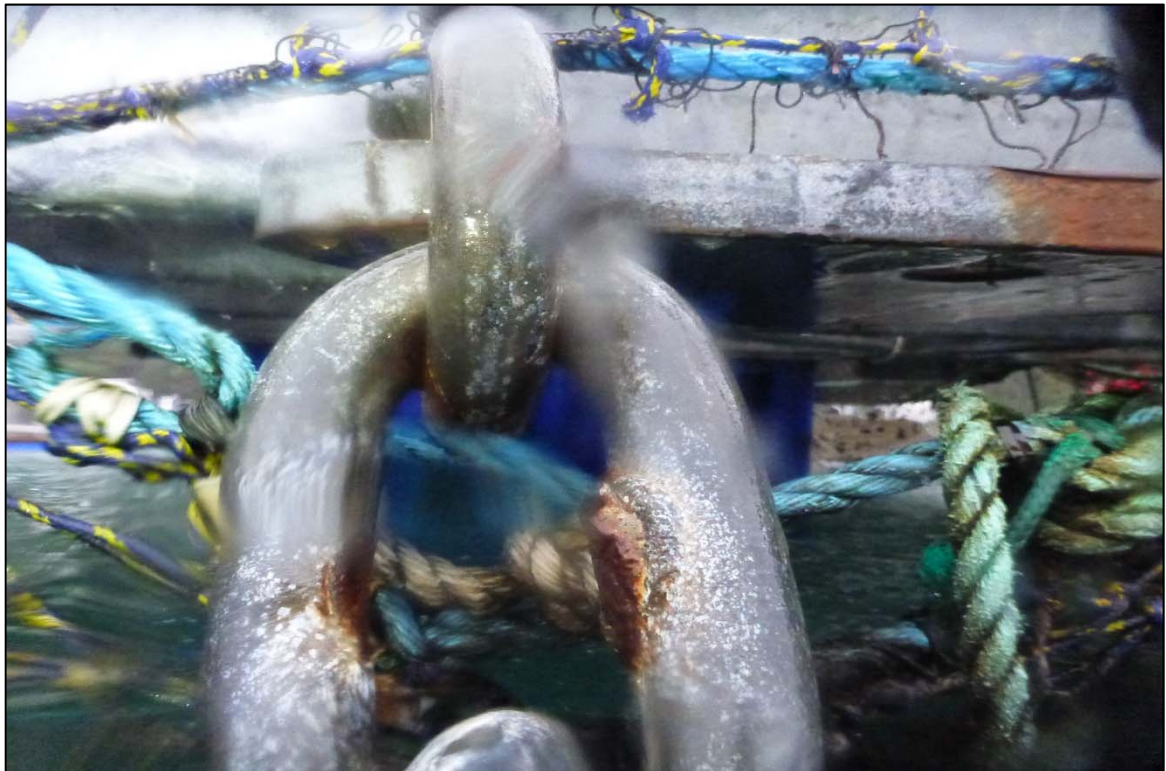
View of Upper Anchor Chain to Anchor Rope Connection (Shackle and Safety Rope) at Site 3 Anchor Line 7, Looking Southeast.
